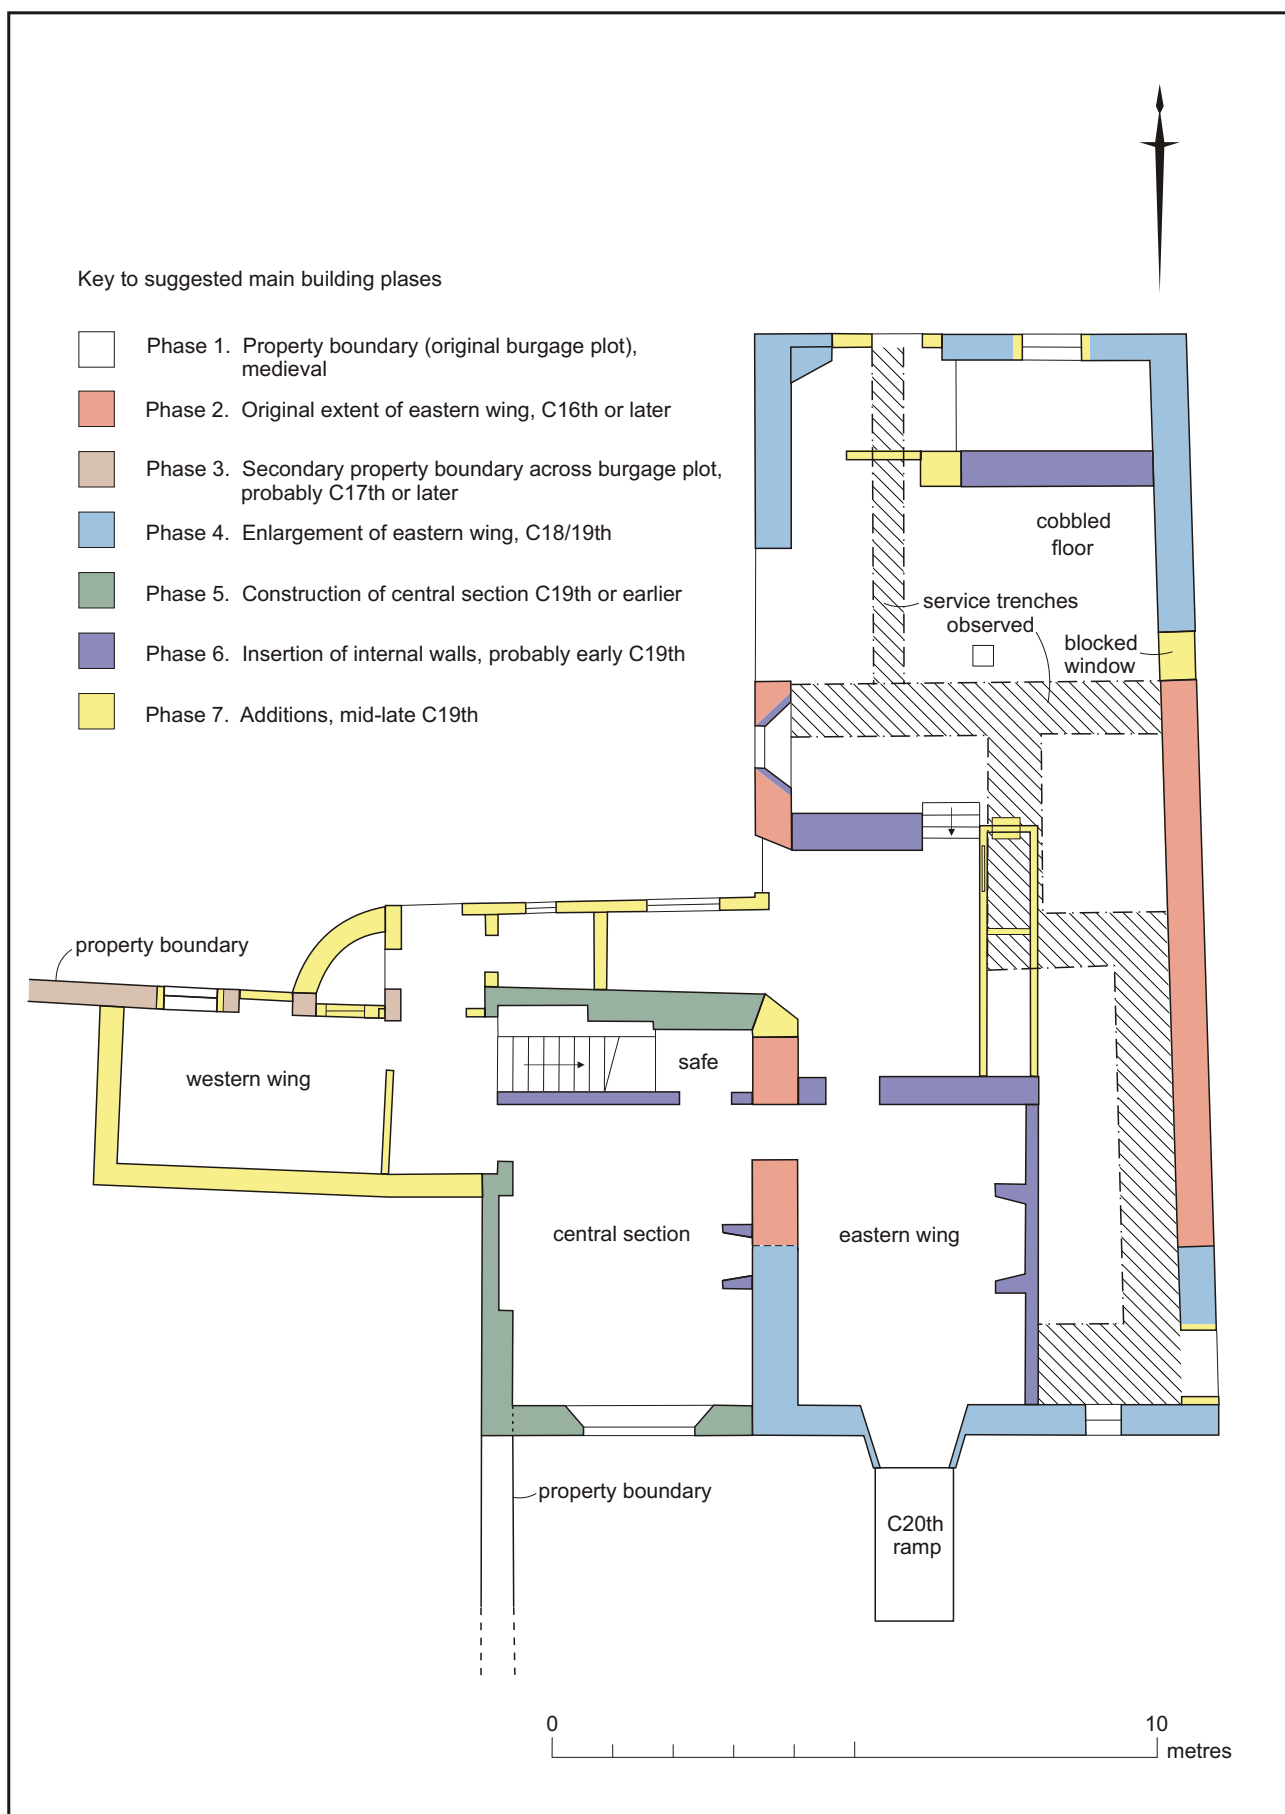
Ground floor plan of Paradise Cottage with suggested phasing, based on restricted observations and ground works. Adapted from plan supplied by Sustainable Design Collective, Totnes. Scale 1:125.
